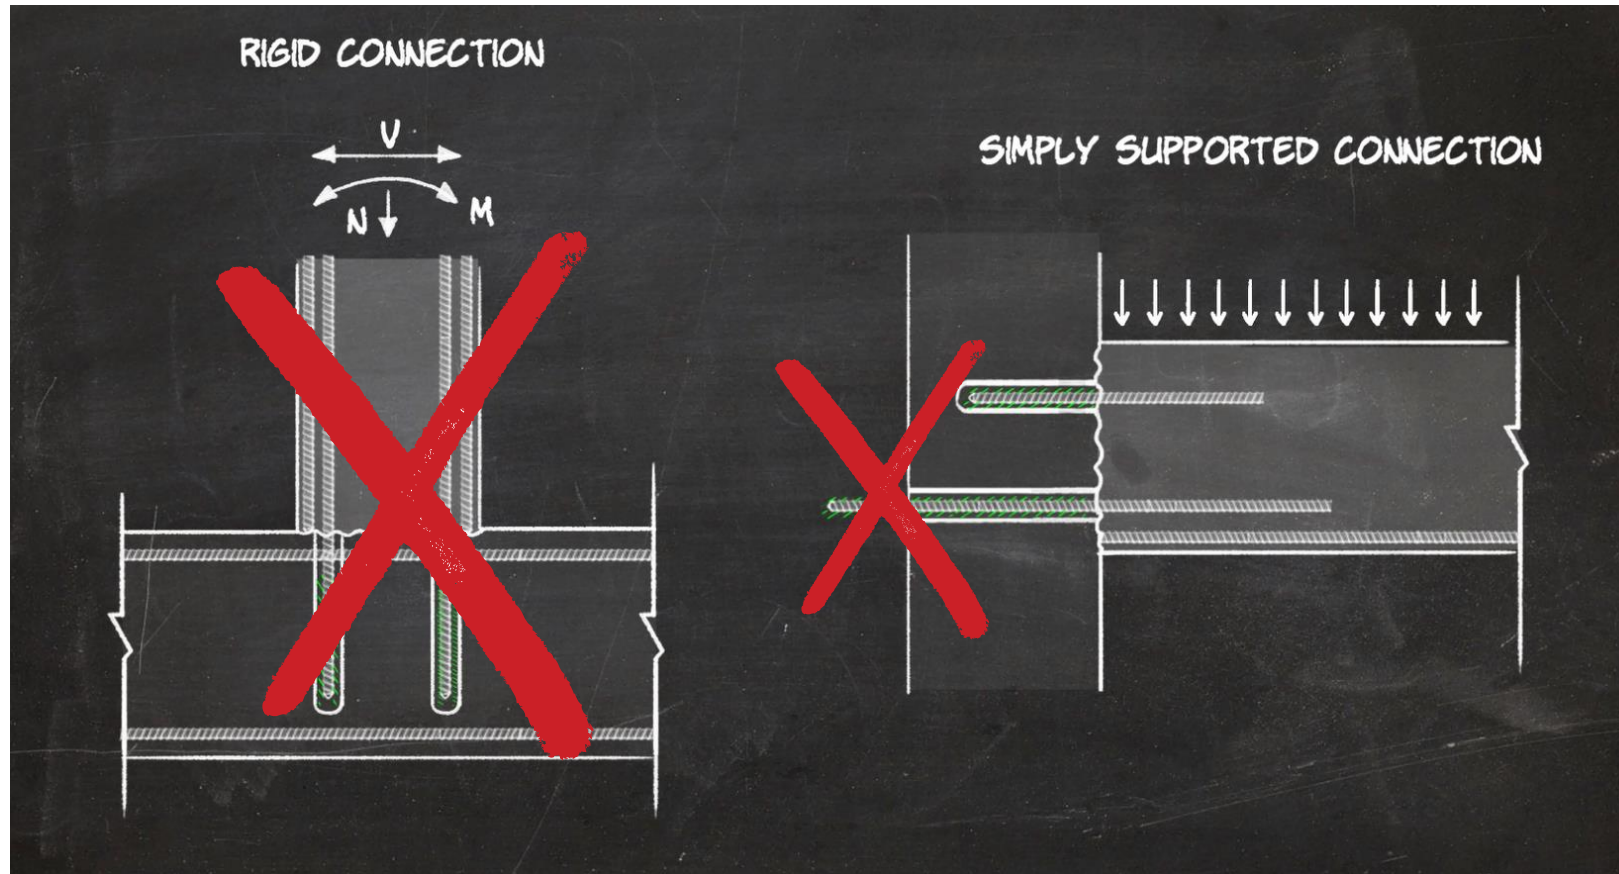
Anchoring of reinforcement to cover the concrete joint
